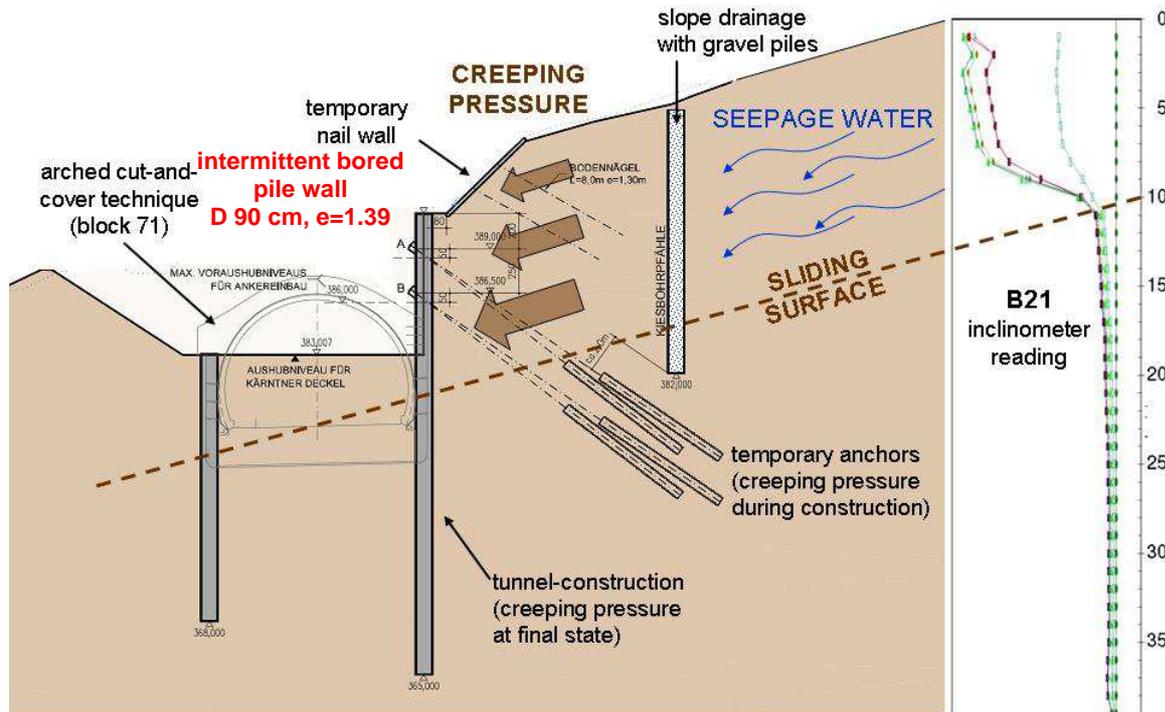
City Tunnel Waidhofen an der Ybbs. Tunnel cross section in the area of the cut-and-cover tunnel with an arched ceiling (section 71) with identified main sliding surface within the creeping mass. Retaining structure made of an intermittent anchored bored pile wall, pre-stressed anchors and temporary nail wall. The position of the gravel piles and the results of inclinometer measurements are shown.
